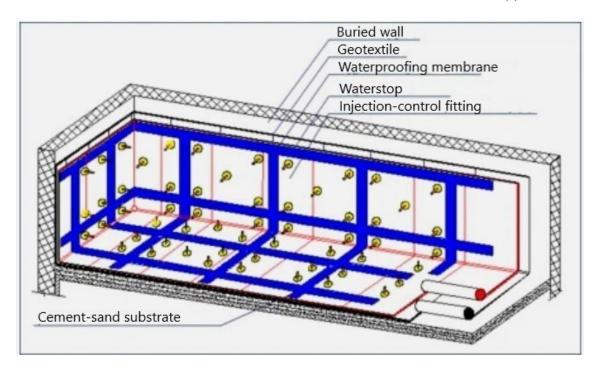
The scheme of waterproofing underground structures using the "buried wall" method.
